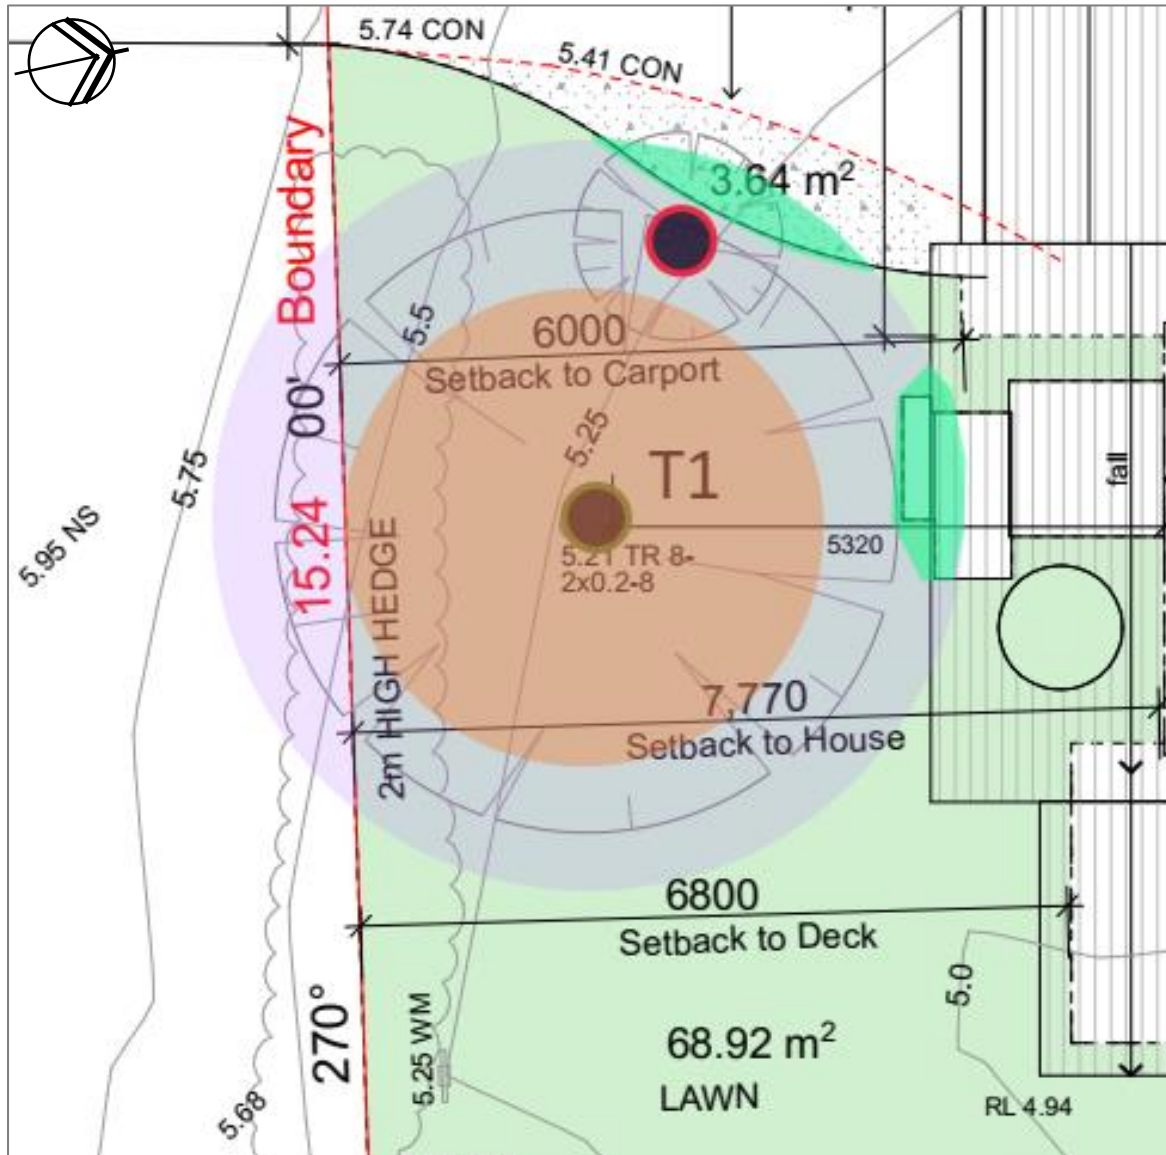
Tree 1 encroachment calculation – Purple shaded circle indicates TPZ, the orange shaded circle denotes the SRZ, green shading denotes encroachment. Excerpt of Site & Roof Plan, dwg no. DA01, 16/06/22 by Site Specific Designs. NOT TO SCALE. Marked up by C Hughes.
